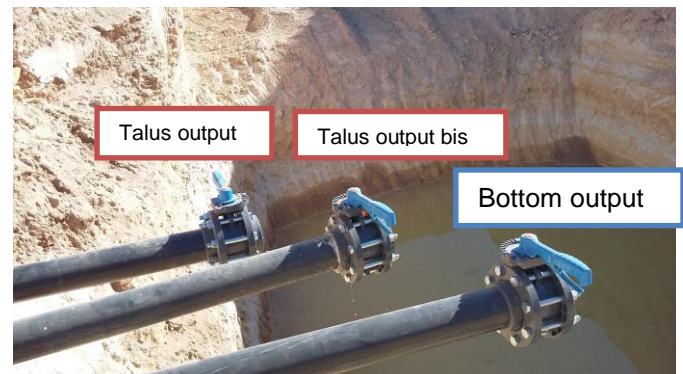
Detail of the outlets of the three collectors at the level of the drainage basin.
